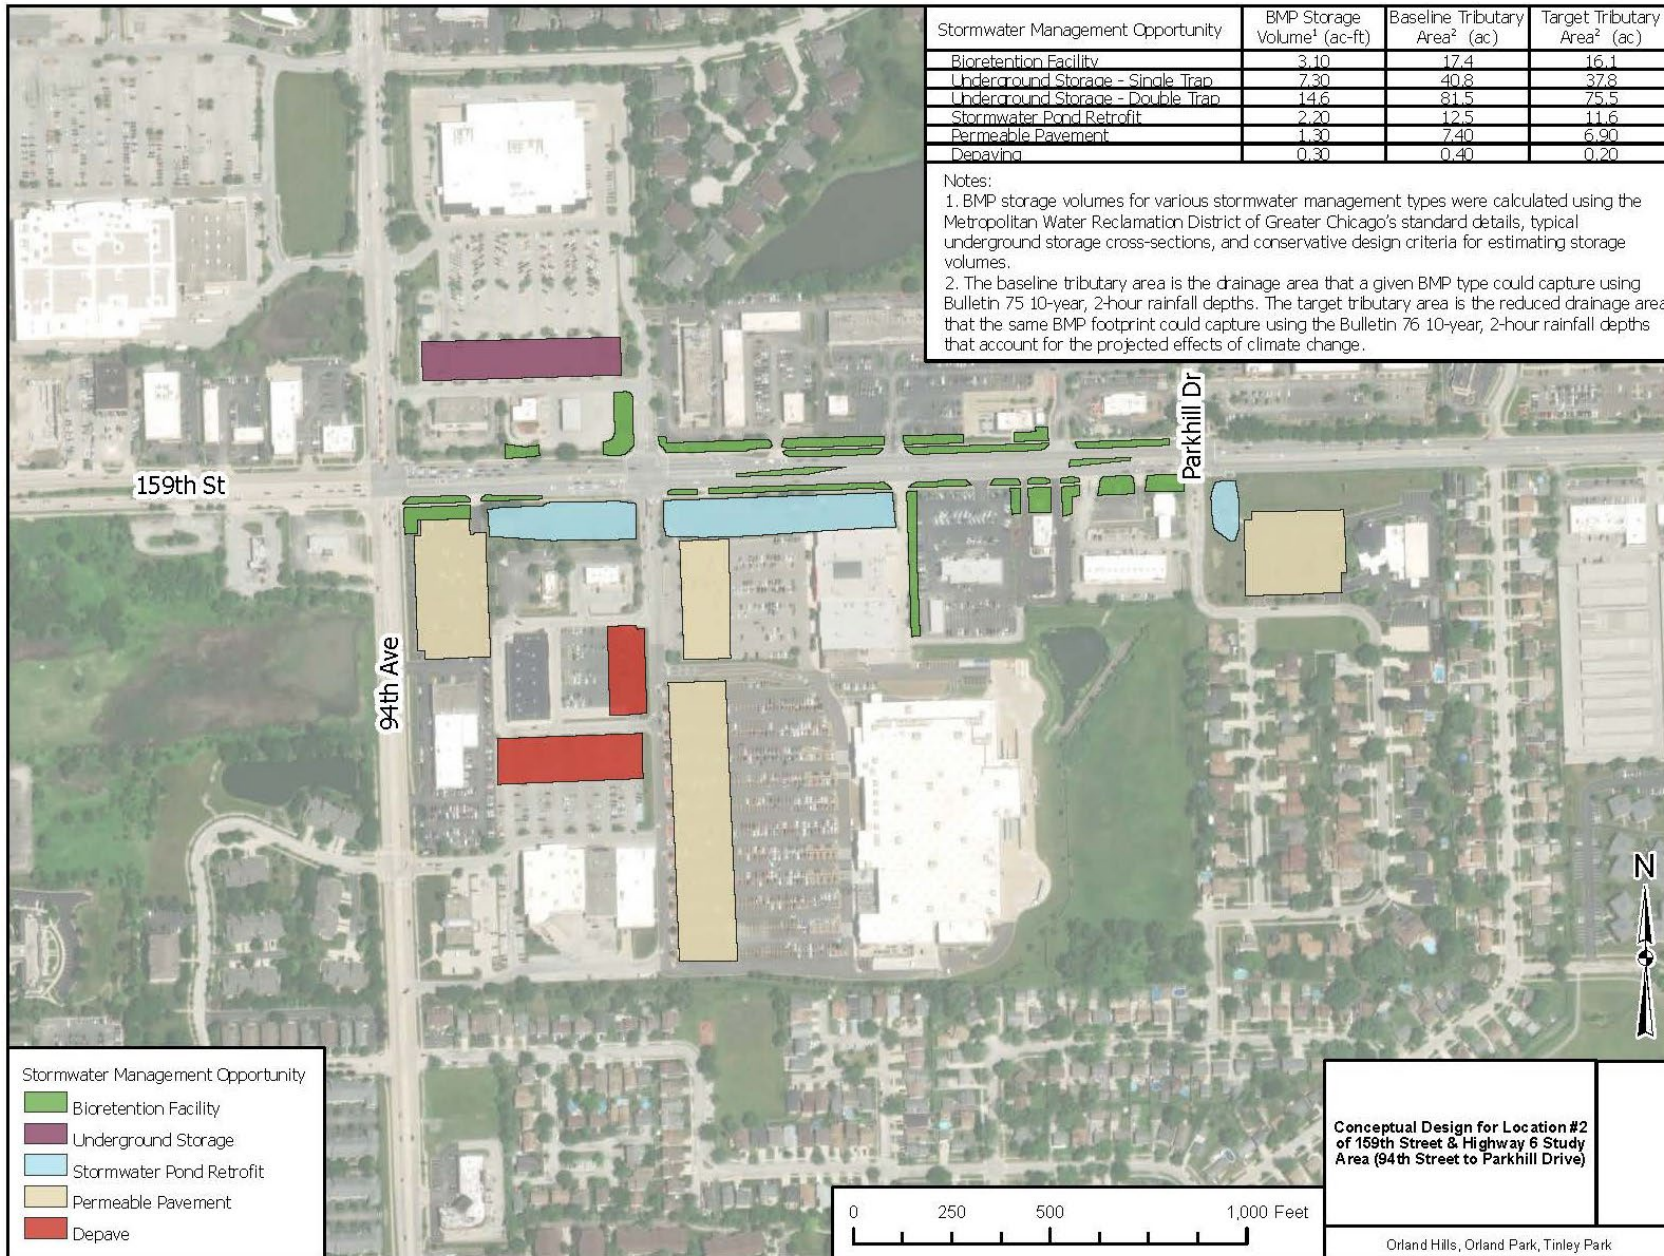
Conceptual design for location #2 of 159th Street and Highway 6 study area (94th Street to Parkhill Drive)
